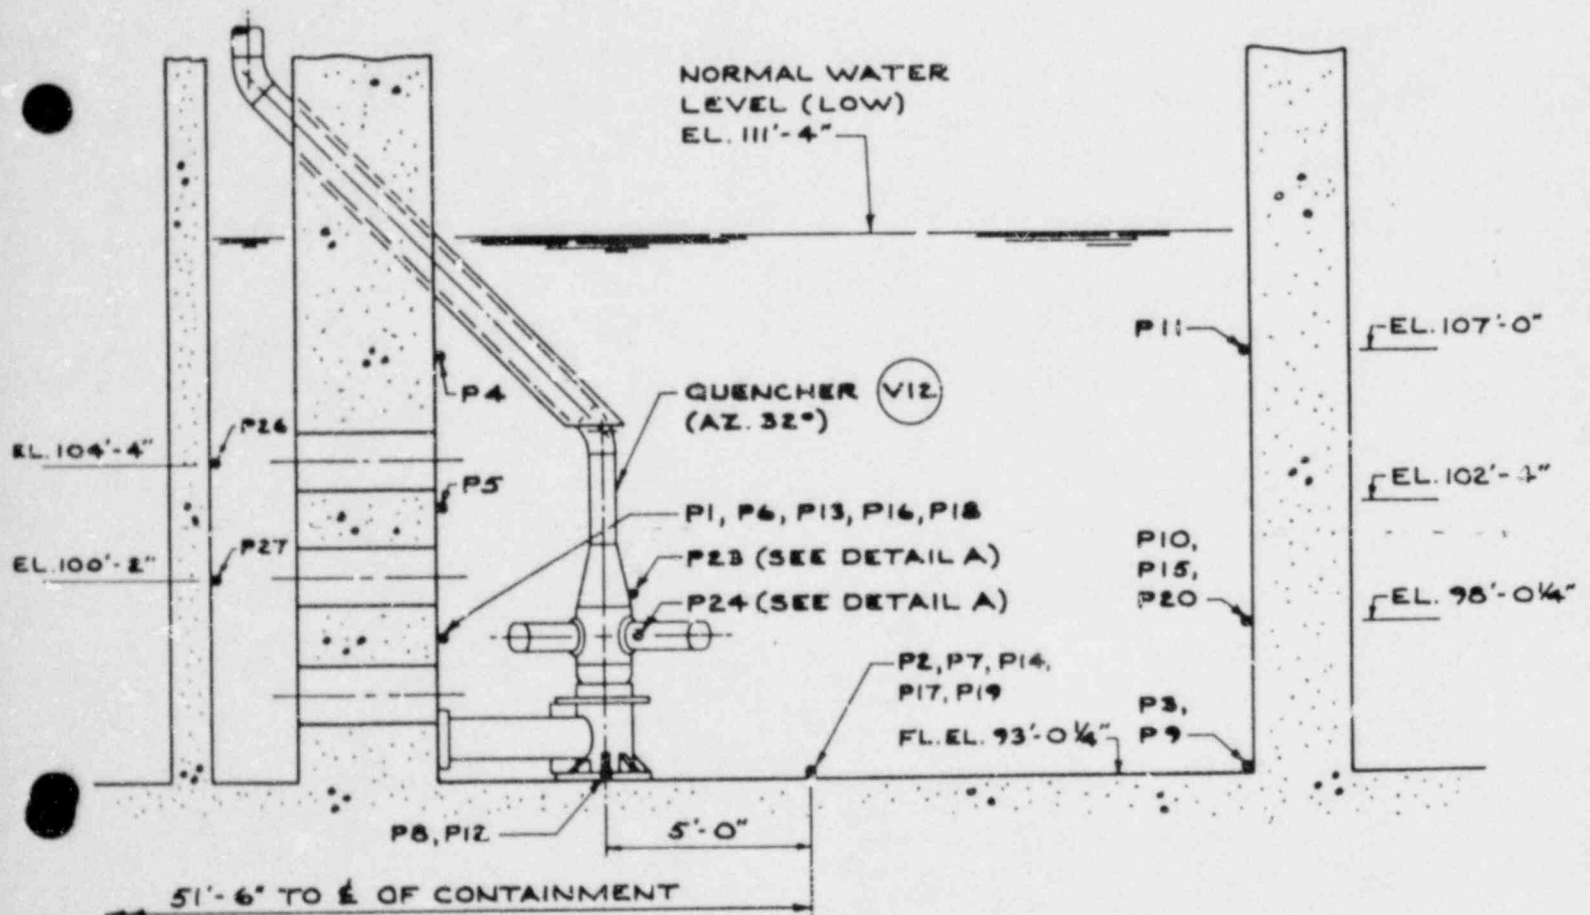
SUPPRESSION POOL PRESSURE SENSORS - ELEVATION VIEW
